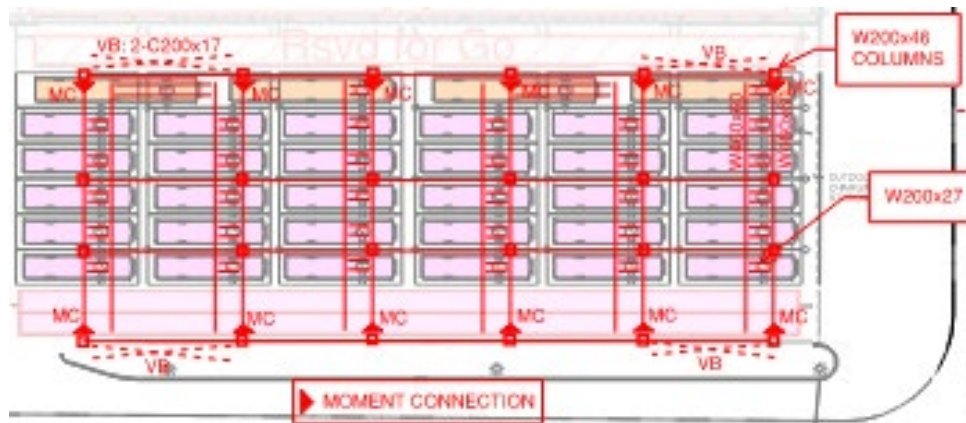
Gantry Framing Plan – Structural Support for Exterior Pantographs.
